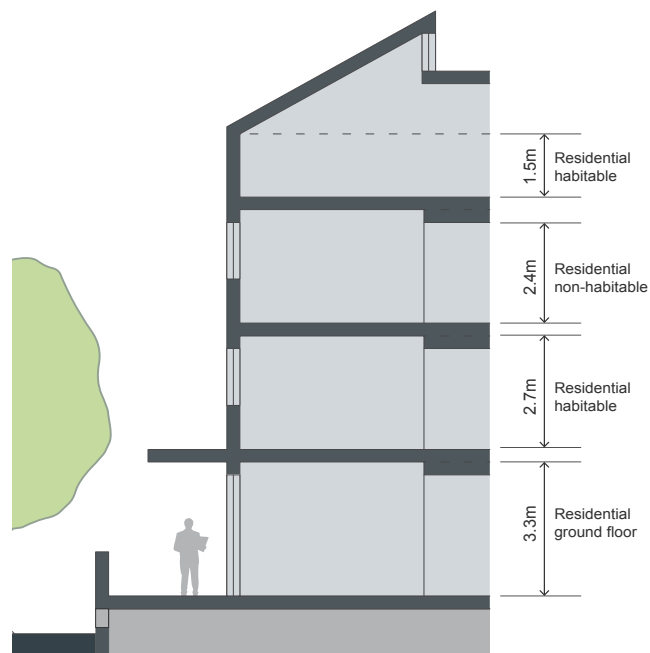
Ceiling heights of minimum 2.7m help to achieve good daylight access and natural ventilation to residential apartments
